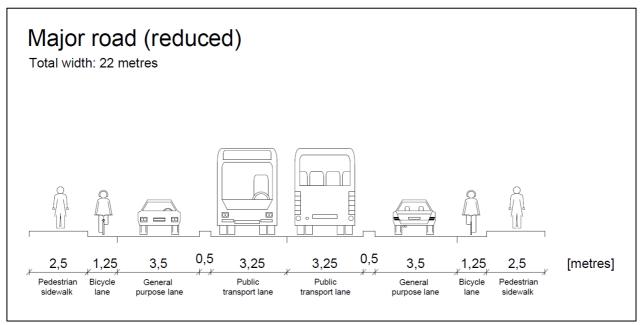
Reduced cross section of major road. [Figure made in AutoCAD]
